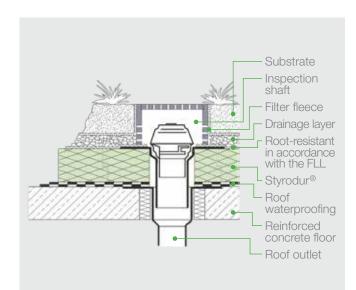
Roof outlet with inspection shaft on an intensive inverted green roof with expanded clay seepage layer.
